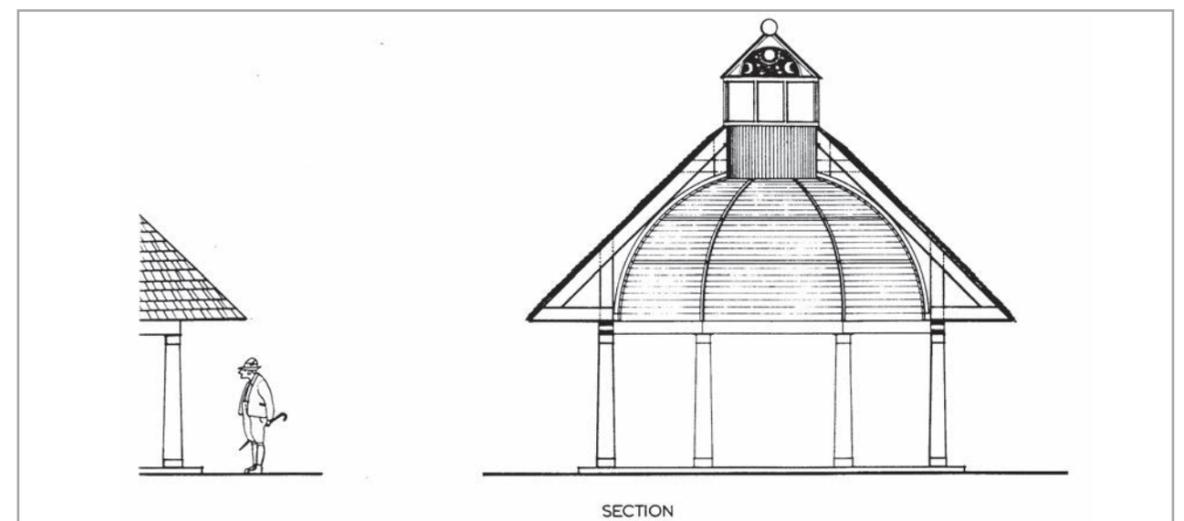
Irish timber pavilion in St. Stephens Green, Dublin.
